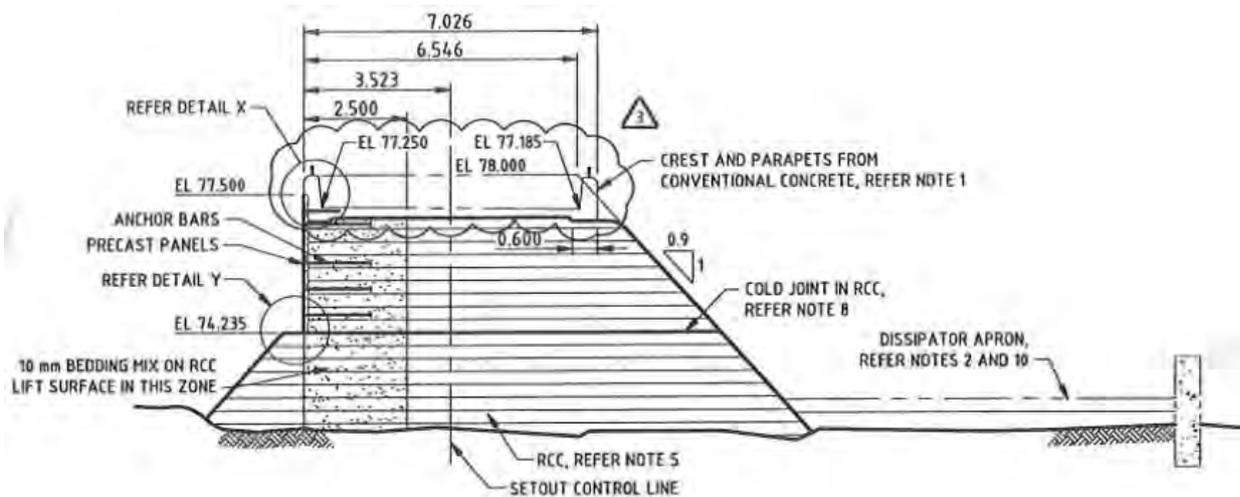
Section through trial embankment looking downstream. (DNR.006.0001, .0099)
